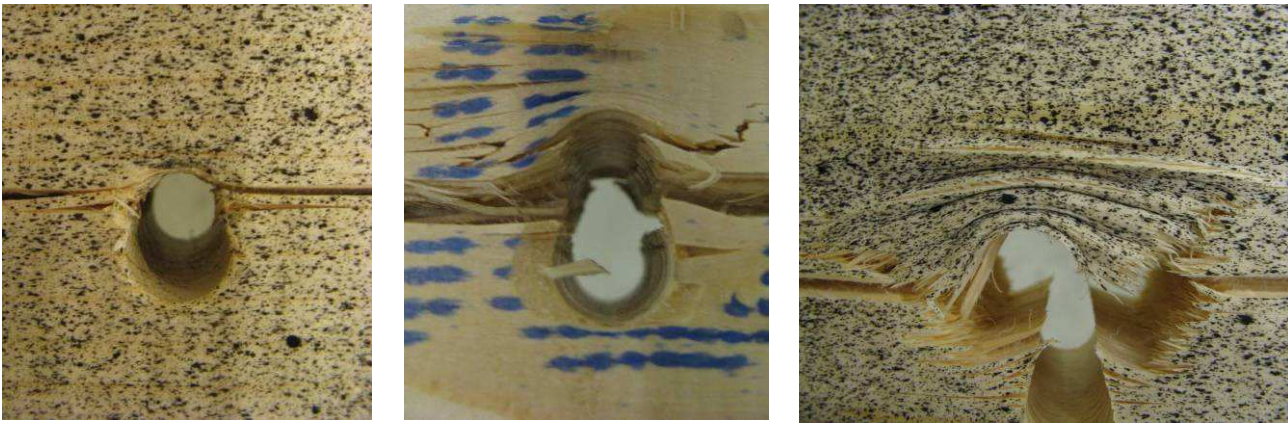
Fastener holes after failure of bending test specimens (series C)
